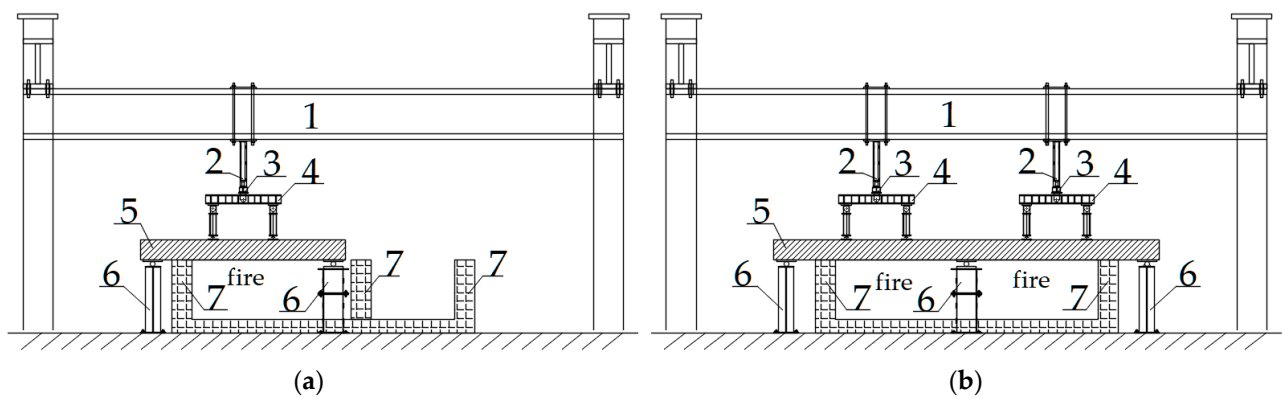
Test equipment: 1—longitudinal reaction steel beam; 2—hydraulic jack; 3—pressure sensor; 4—loading steel beam; 5—test beam; 6—steel bearing; 7—furnace wall; (a)—continuous beam loading device (b)—simply supported beam loading device.
